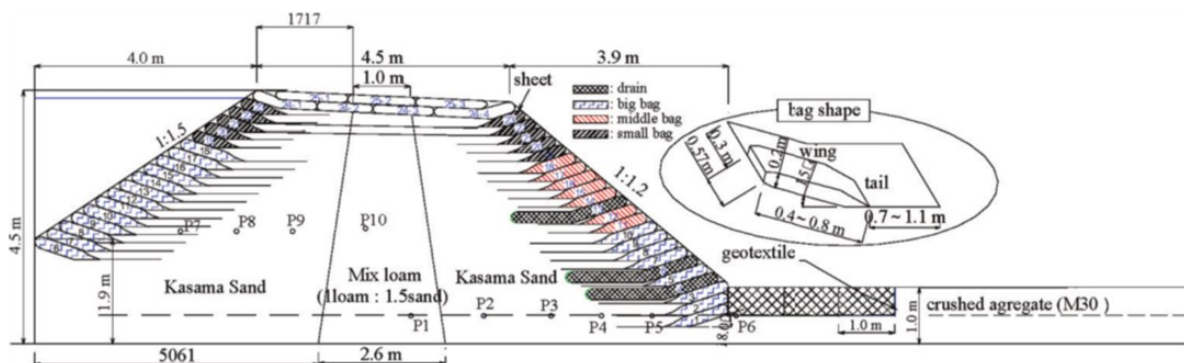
Cross section of a full-scale field model earth-fill dam (Mohri et al., 2007).
